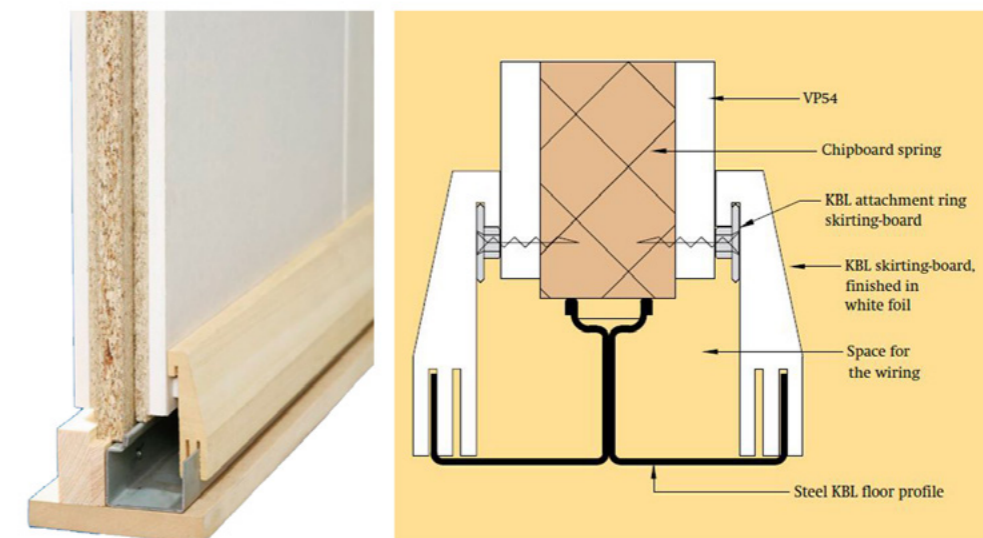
Faay KBL isometric view and detailed section (Source: Faay)
